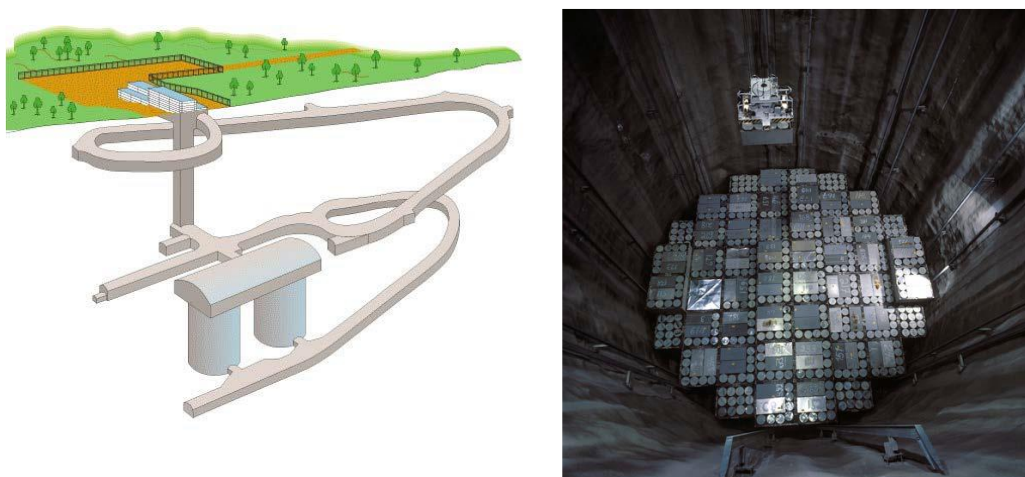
The Olkiluoto LLW disposal facility. Cross-sectional view of the facility (left) and LLW drums in the disposal silo (right). [Finland, 2020]
